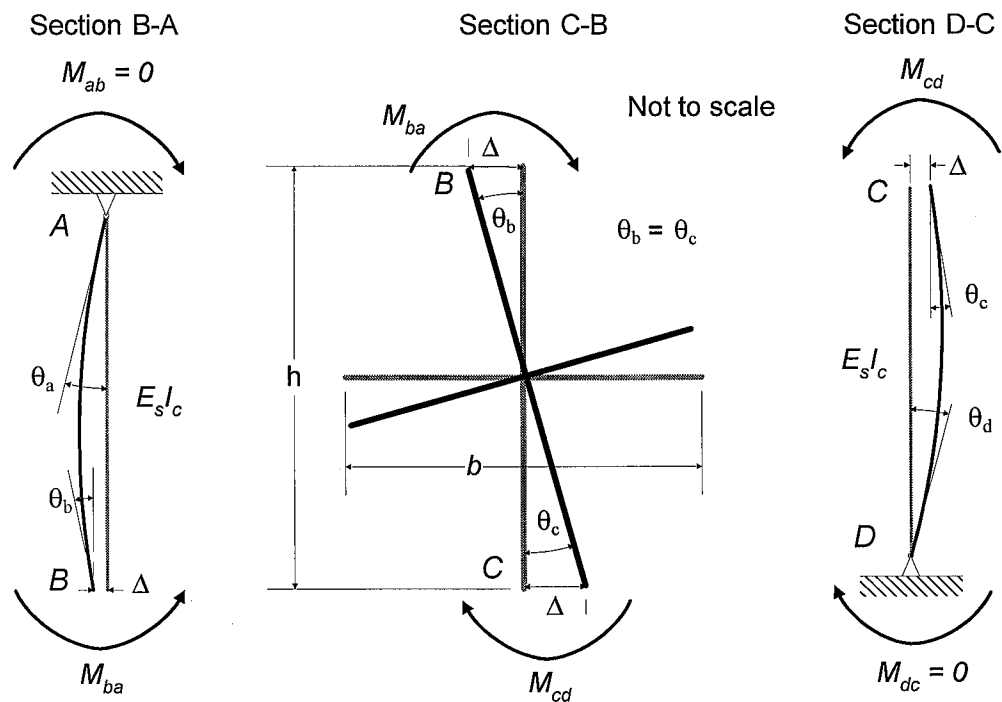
Elevation V: Column and Panel Zone Sections B-A, C-B, and D-C
